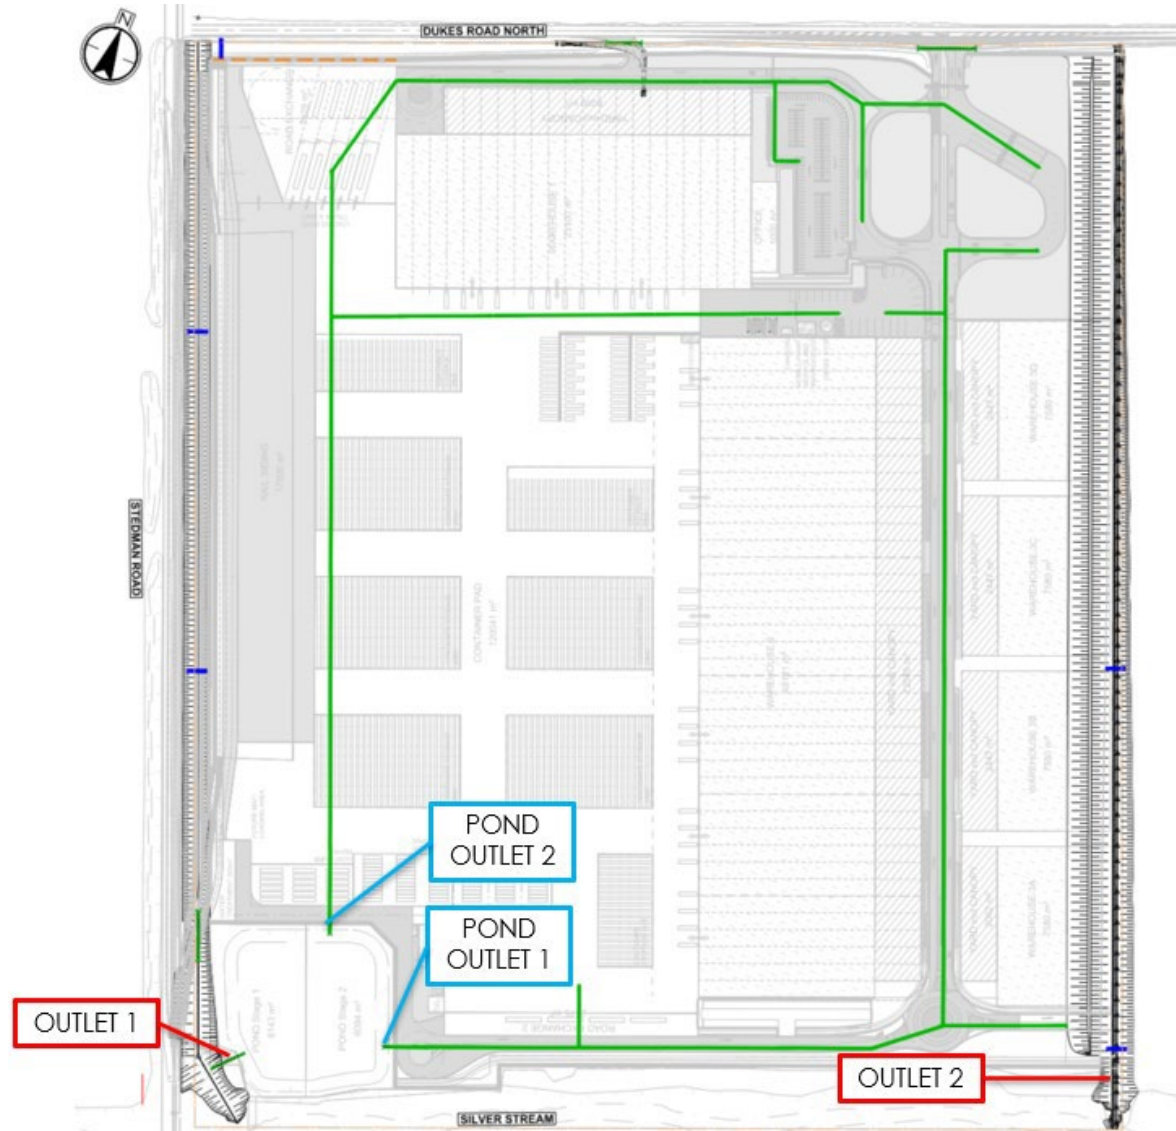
Stormwater treatment and discharge plan (Stantec, 2026). GPT/UPT proposed at Pond Outlet 1 and 2. Outlet 2 conveys 'external' stormwater only.
